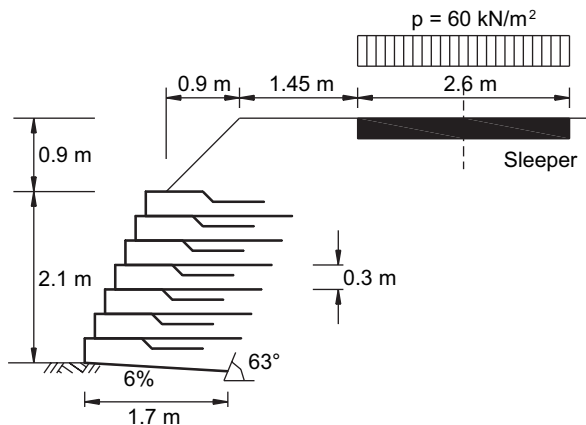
Cross-section of the Vienna railroad embankment, Austria (Mannsbart and Kropik, 1996).
